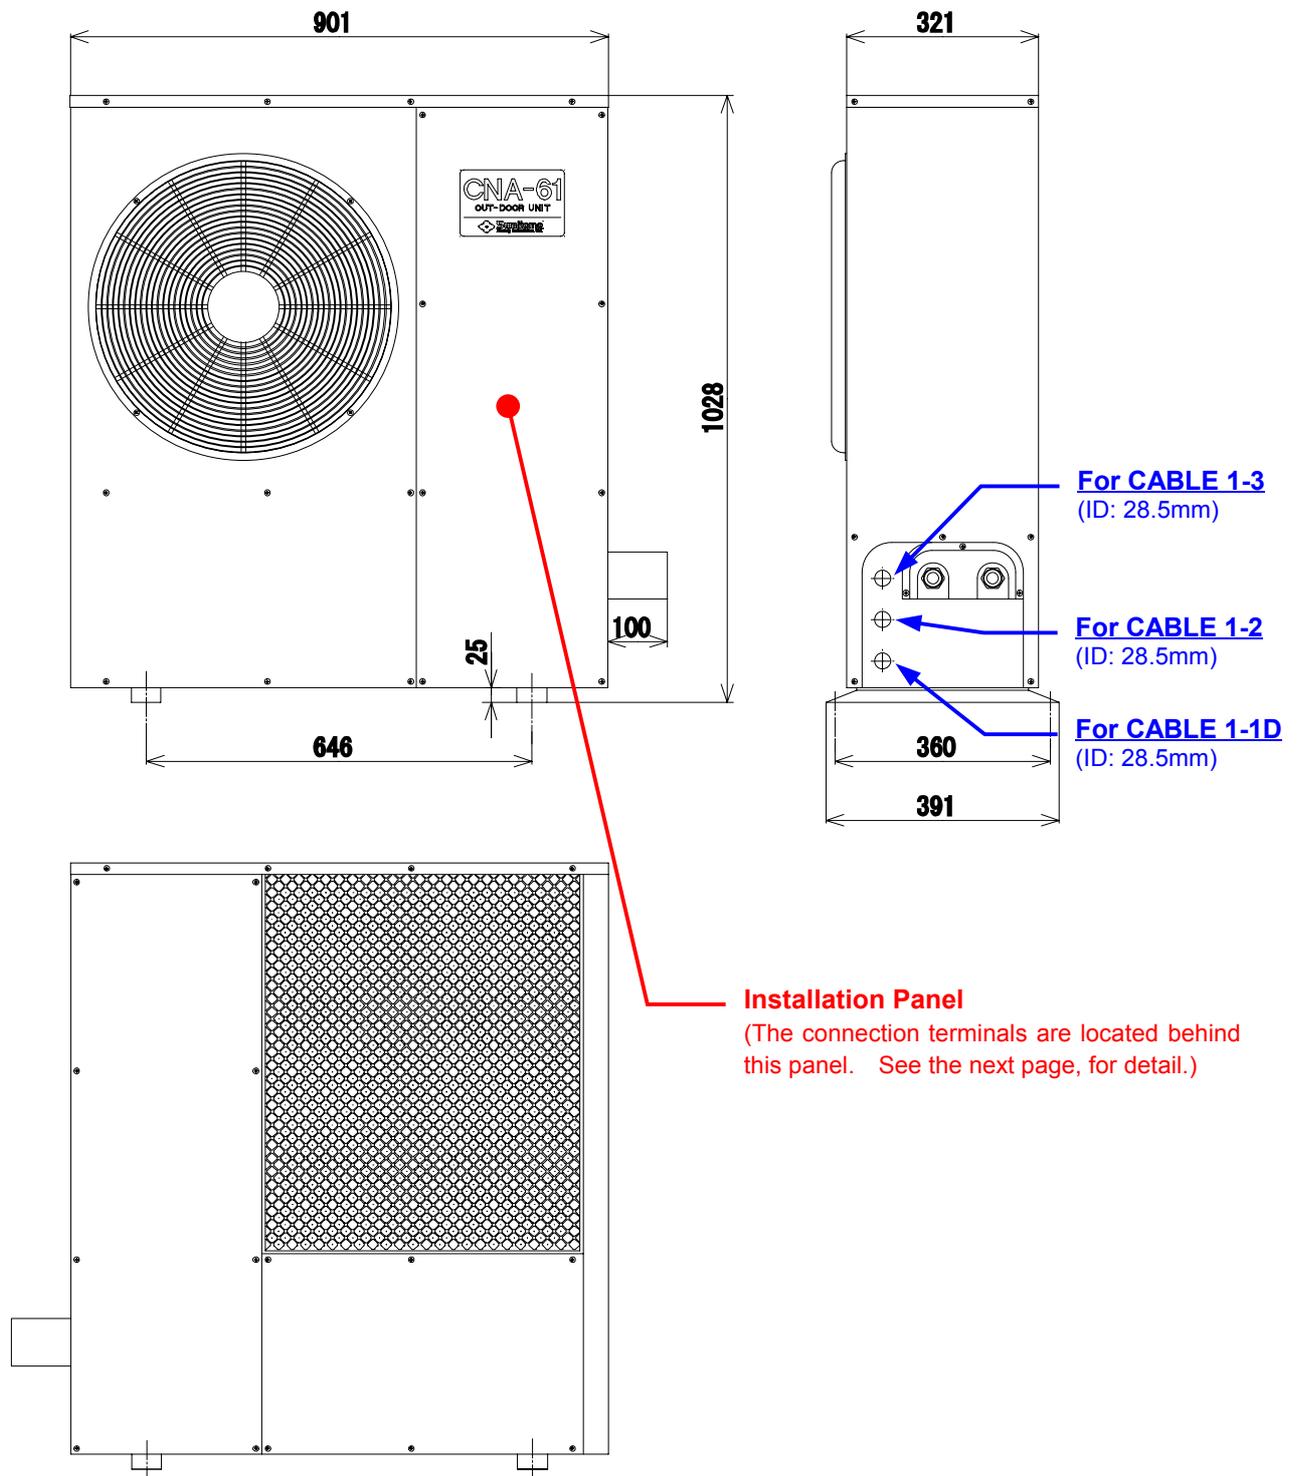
PASS TROUGH HOLE POSITION OF OUT-DOOR UNIT
